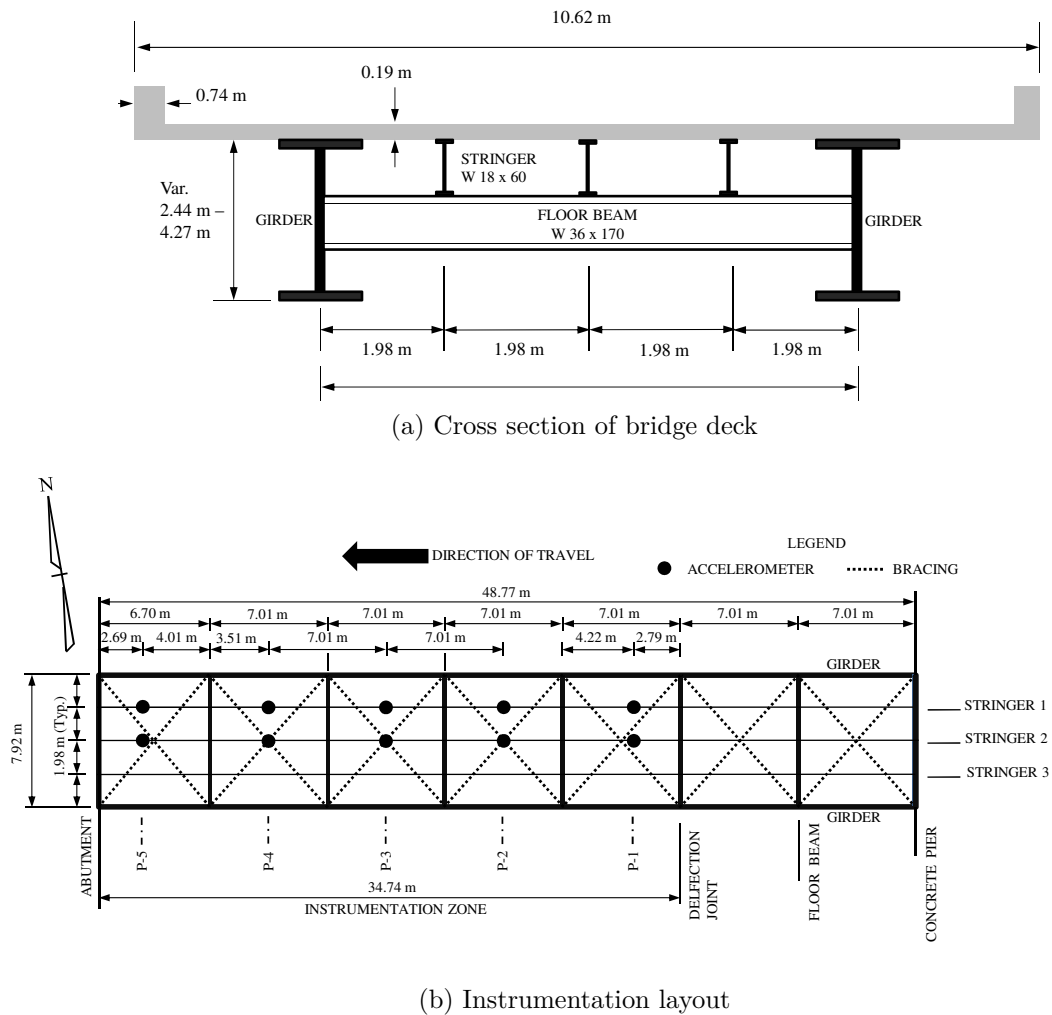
(a) Cross section of bridge deck and (b) instrumentation layout (See Fig. 4.5 for the 3D FEM)
